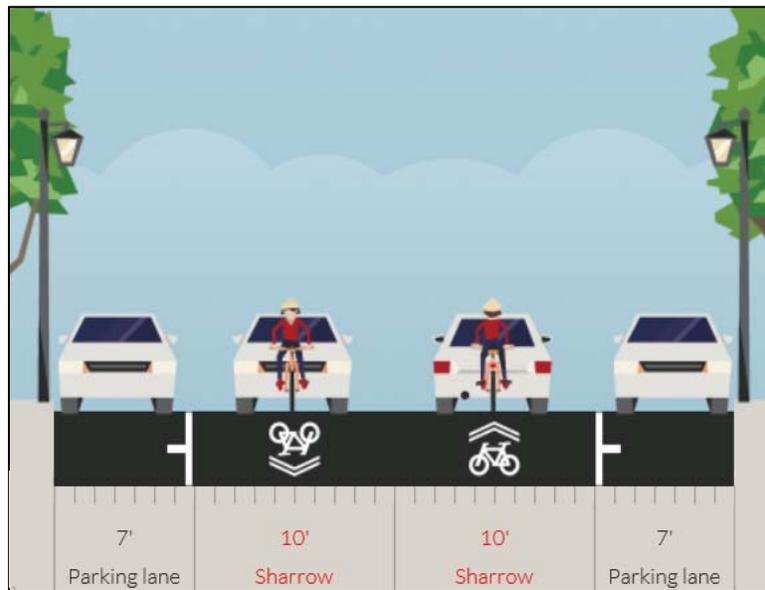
TYPICAL BIKE BOULEVARD CROSS SECTION. NOTE THE LACK OF CENTERLINE STRIPING. (IMAGE SOURCE: STREETMIX.NET)
